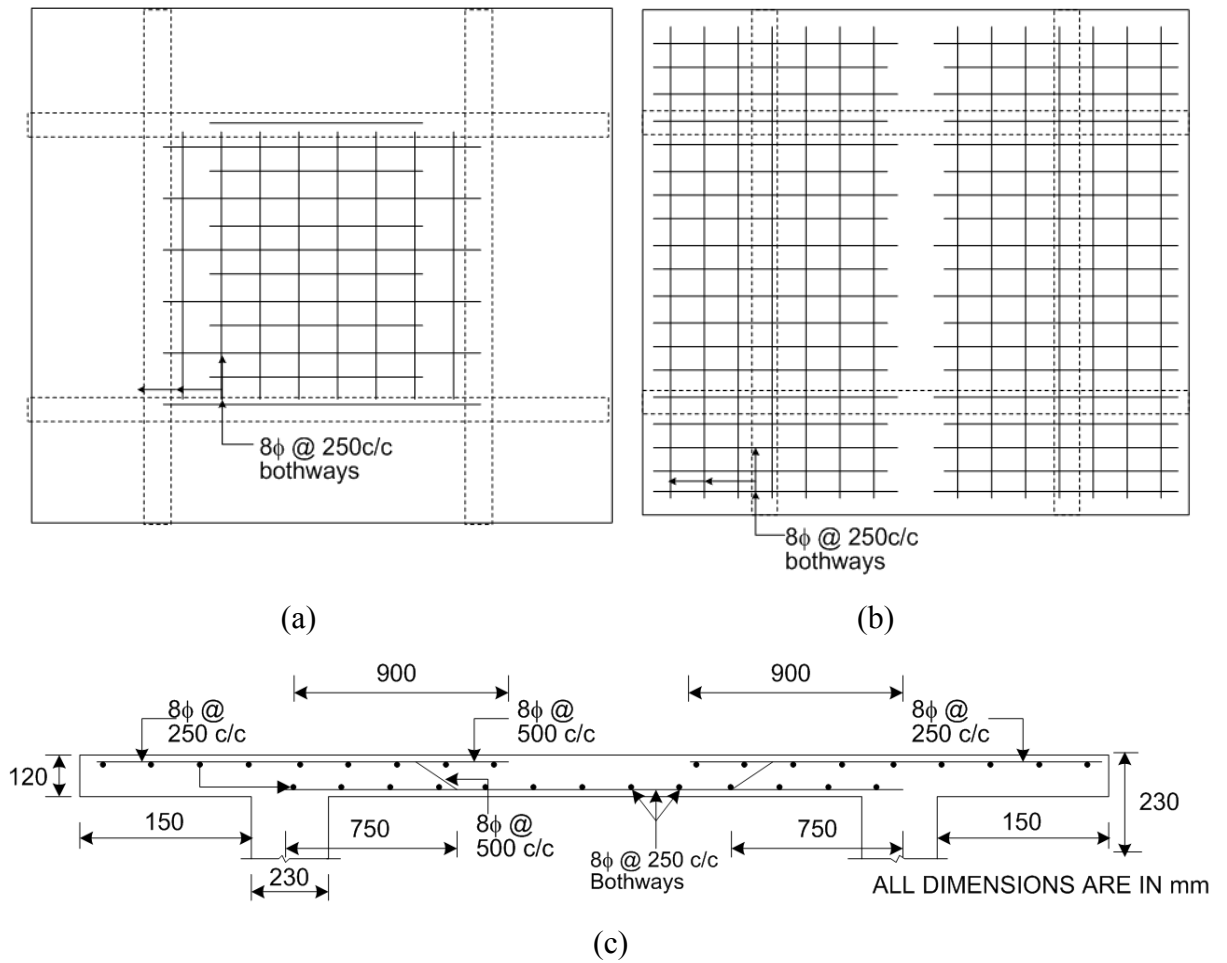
Detailing of Slab (a) Plan showing bottom reinforcement. (b) Plan showing top reinforcement. (c) A section through the slab
